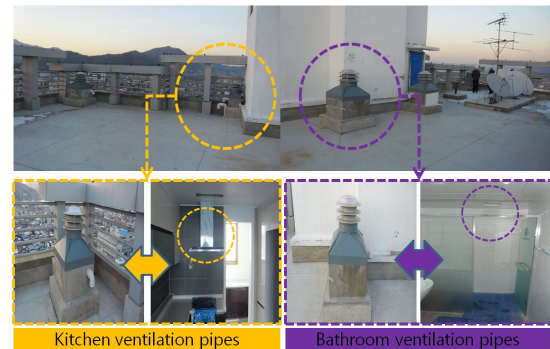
The current state of the kitchen and bathroom ventilation pipes on the rooftop of the subject building
